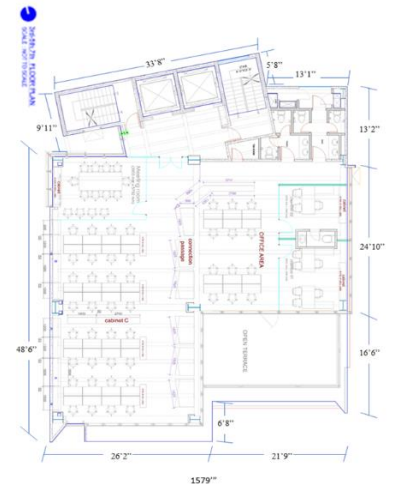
Floor plan of level-3 office floor of Square Food and Beverage
